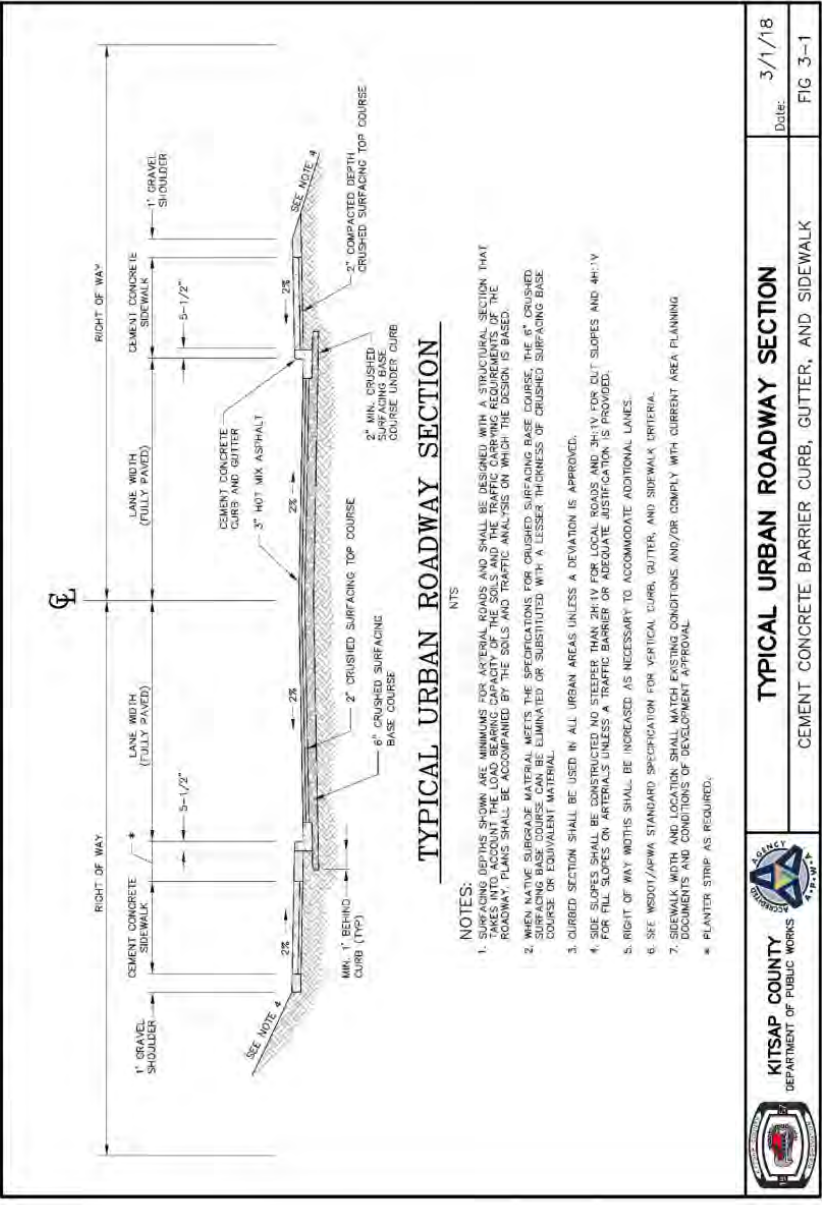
Typical Urban Roadway Section - Cement Concrete Barrier Curb, Gutter, and Sidewalk
